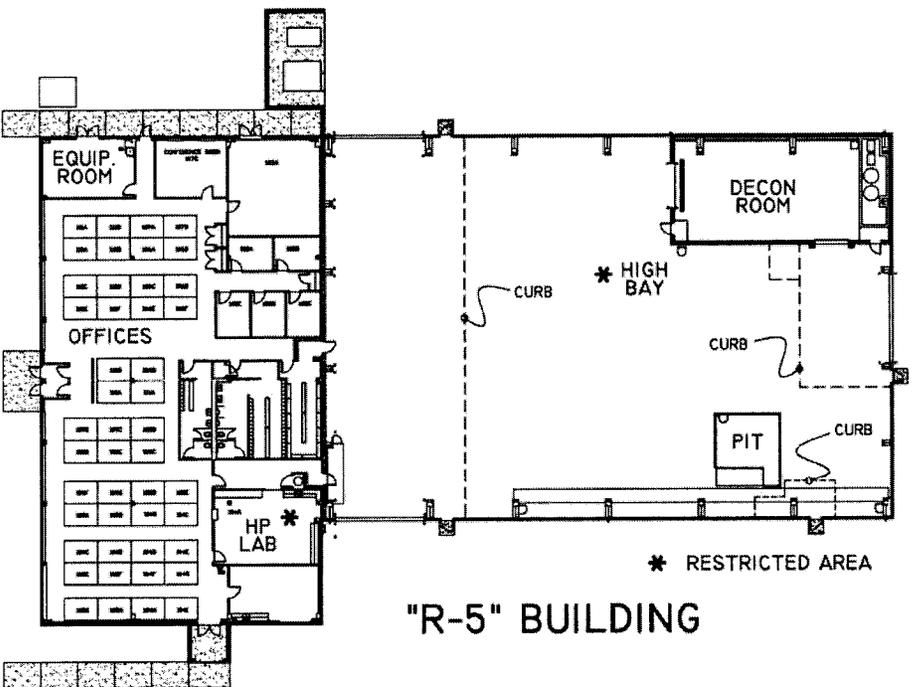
Service Center Floor Plan - R5 Building
